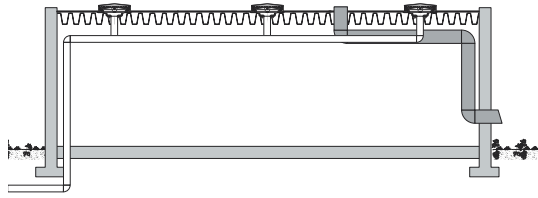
Geberit Pluvia system with emergency drainage through a conventional pipe system
